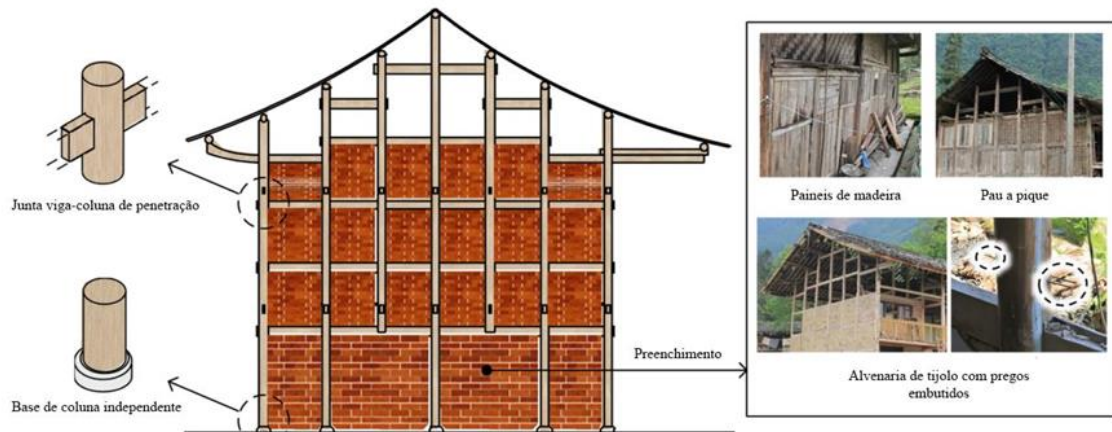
Configuration of a chuandou style wooden structure, filled with masonry
